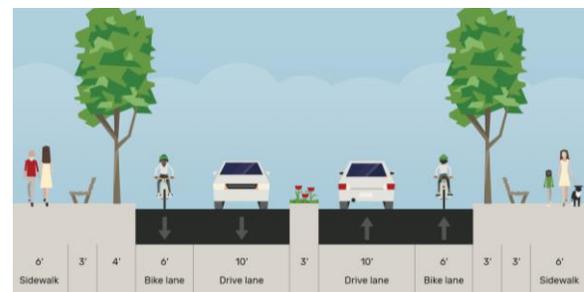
Crosby Ave Proposed Cross Section (Made with Streetmix)
